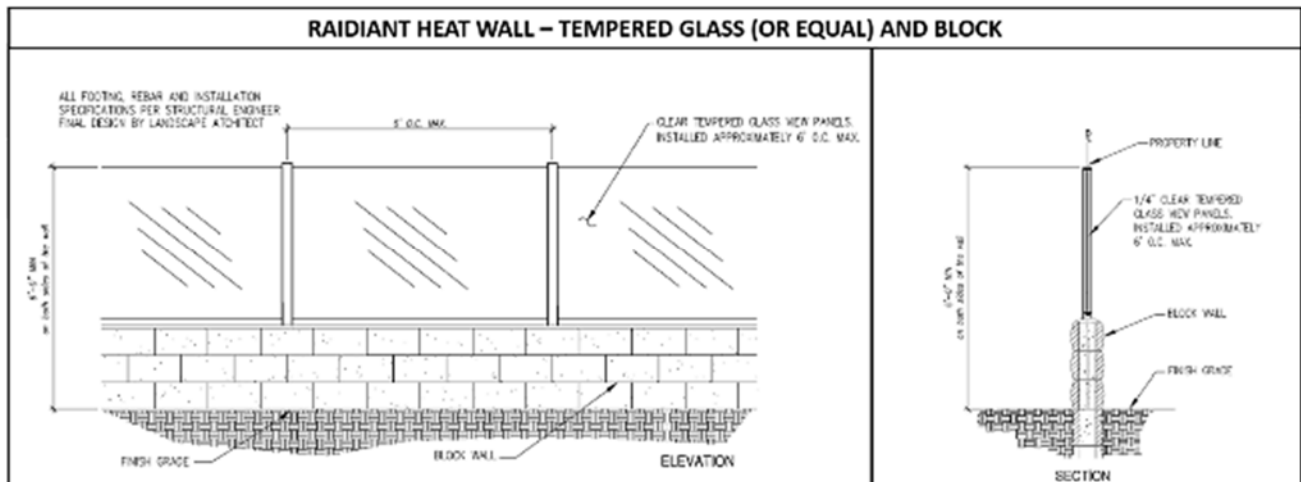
Radiant Heat Wall Detail – Glass over Block
